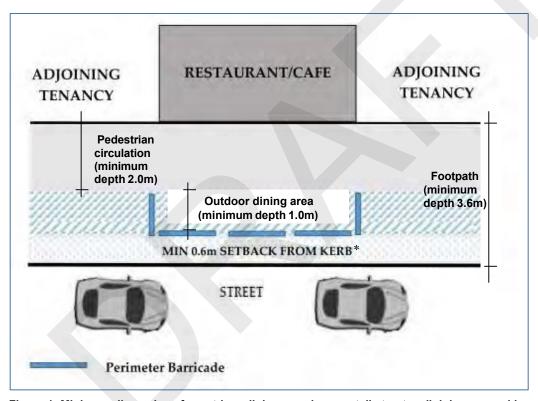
Minimum dimensions for outdoor dining on primary retail streets adjoining car parking.
